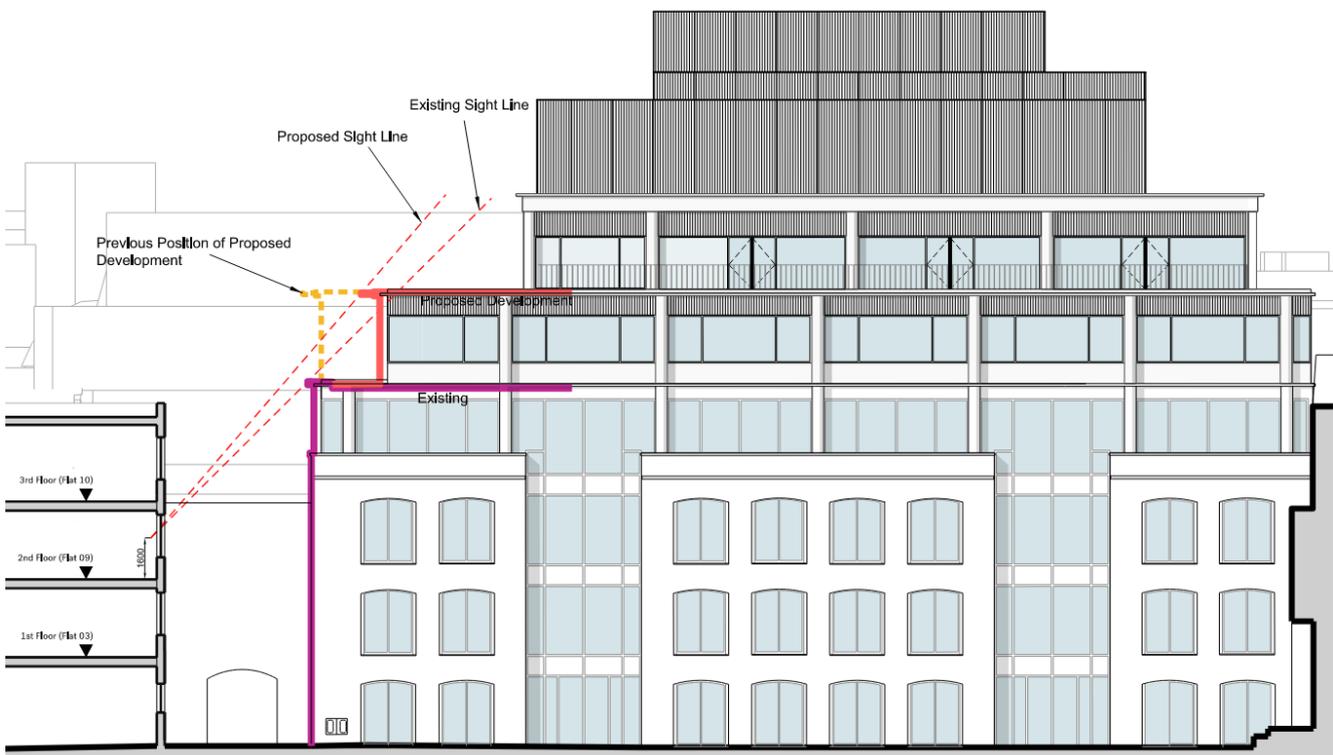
Existing and Proposed sightlines from Flat 9 in the Copperworks
